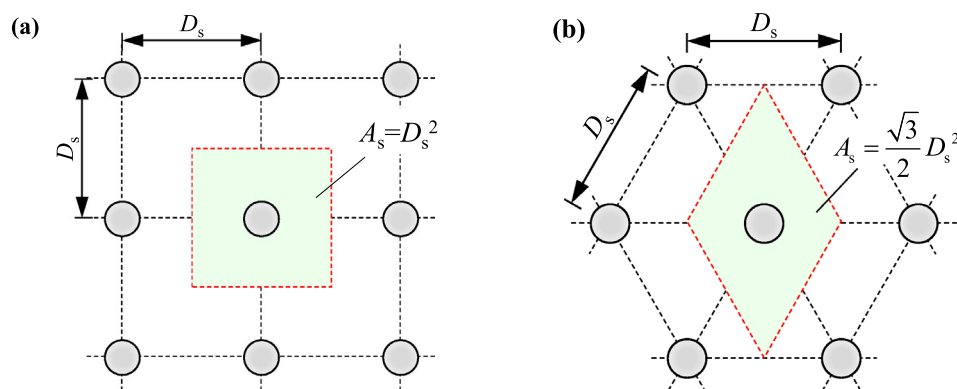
Layout of the anchor group and the reinforcement area for one anchor: a square layout; b equilateral triangle layout
